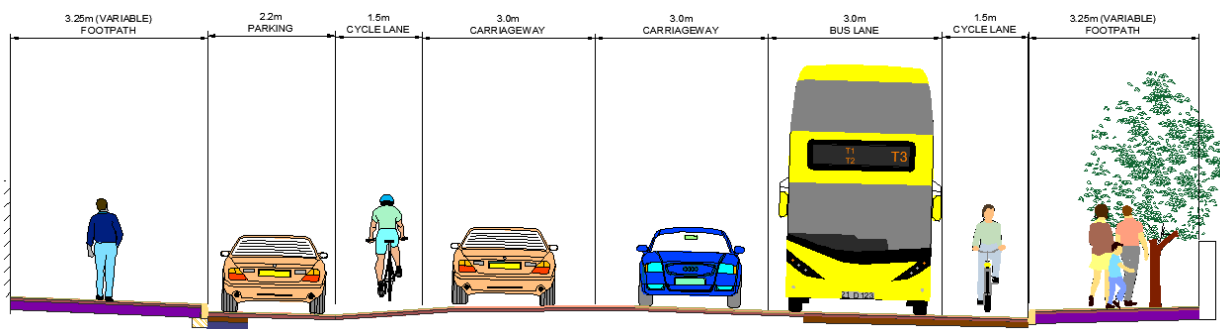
Typical section in Phibsborough Road for Ballymun Sub Section 3A Option B
